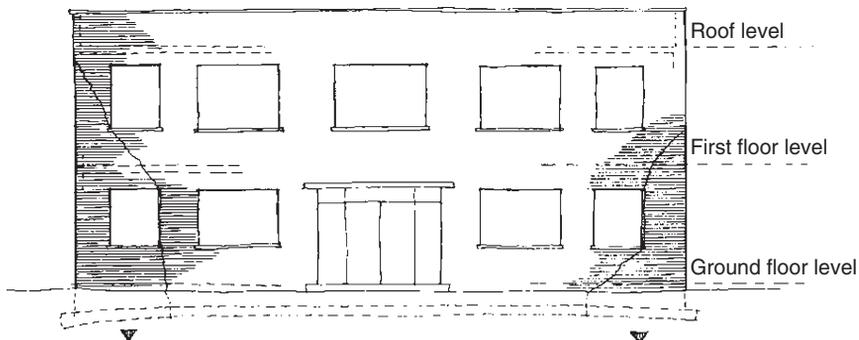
Example of differential settlement. Settlement in end walls with centre portion stable. Cracks increase in width with height, and appear to be interrupted by the windows, but in fact extend round the openings forming a gap between window frame and brickwork. The movement is at its maximum at roof level and could cause loss of bearing in the roof slab
